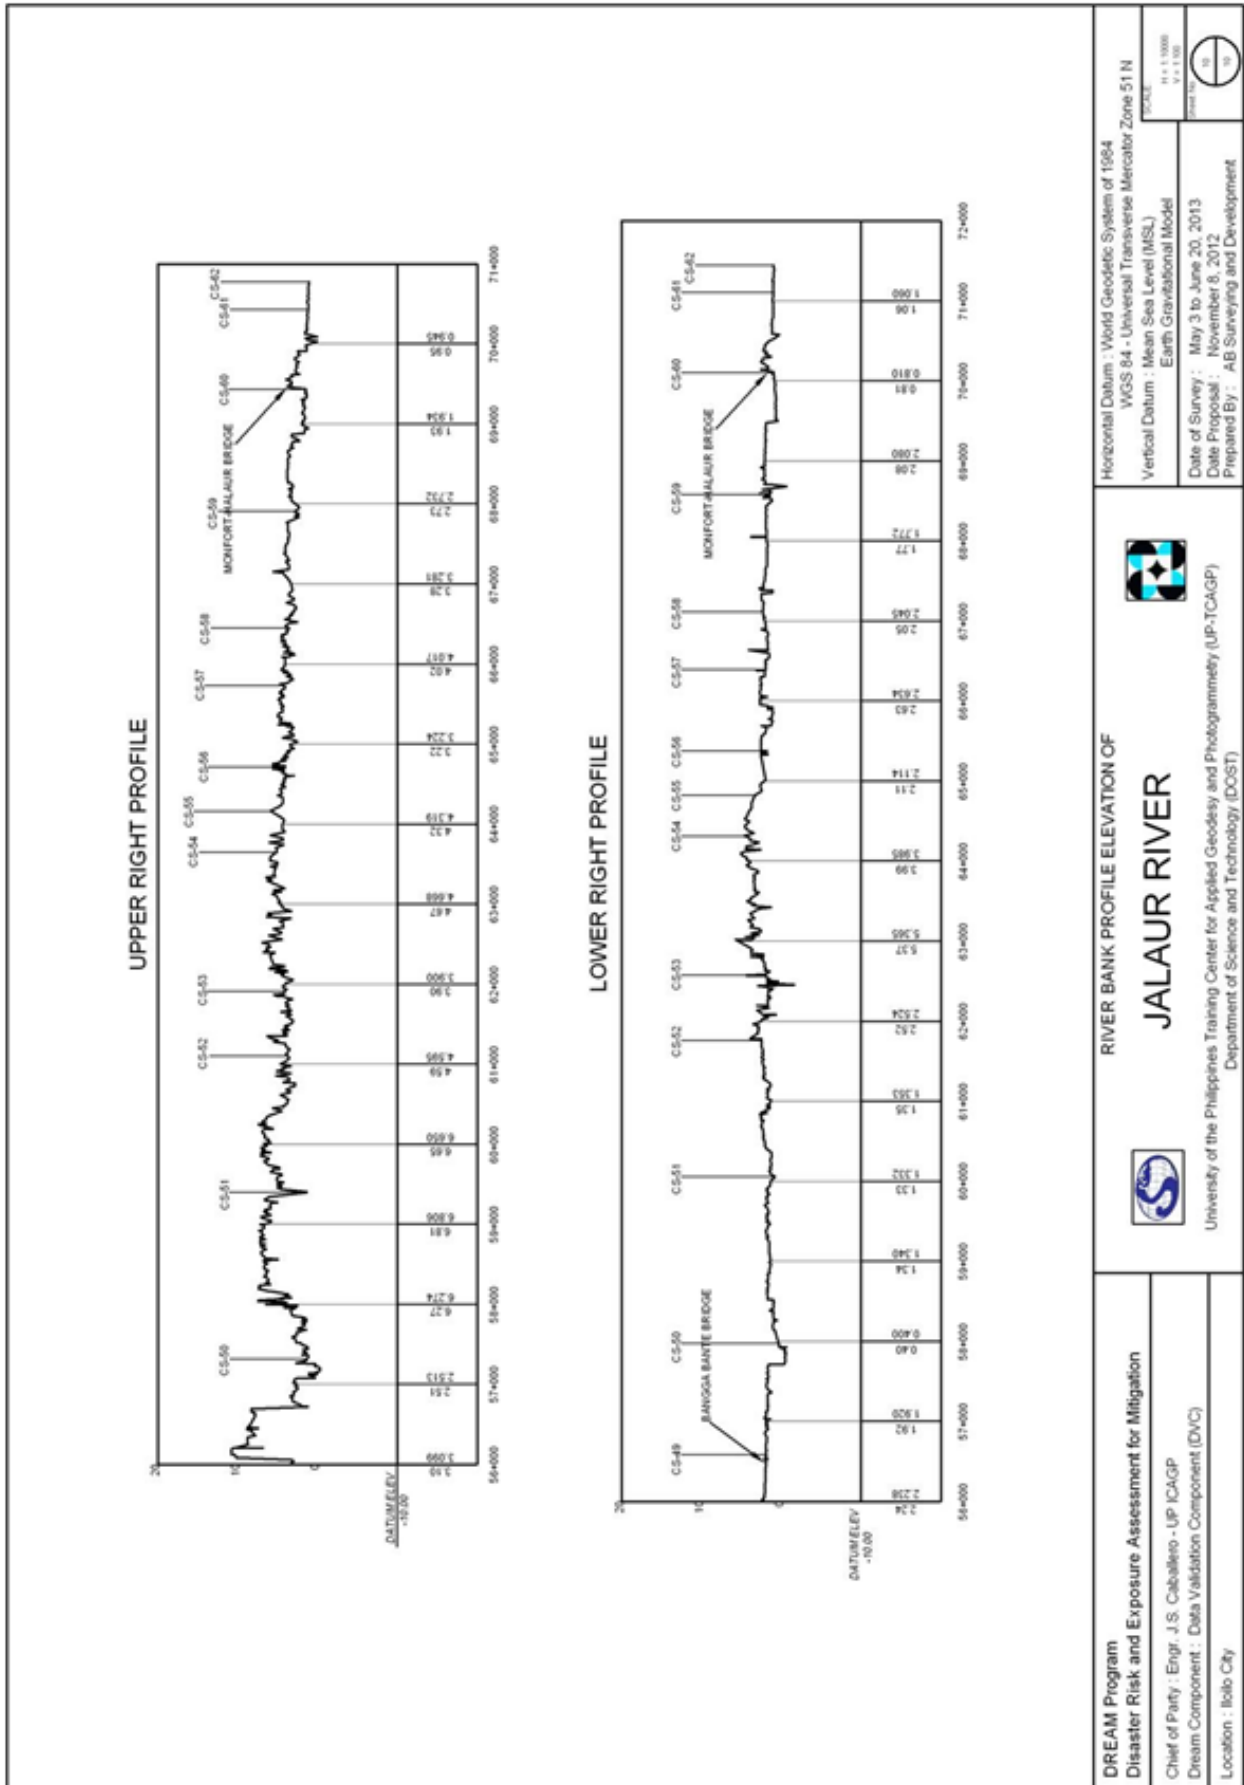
Sheet No. 10 Right River bank profile with relative location of bridge and cross-section
